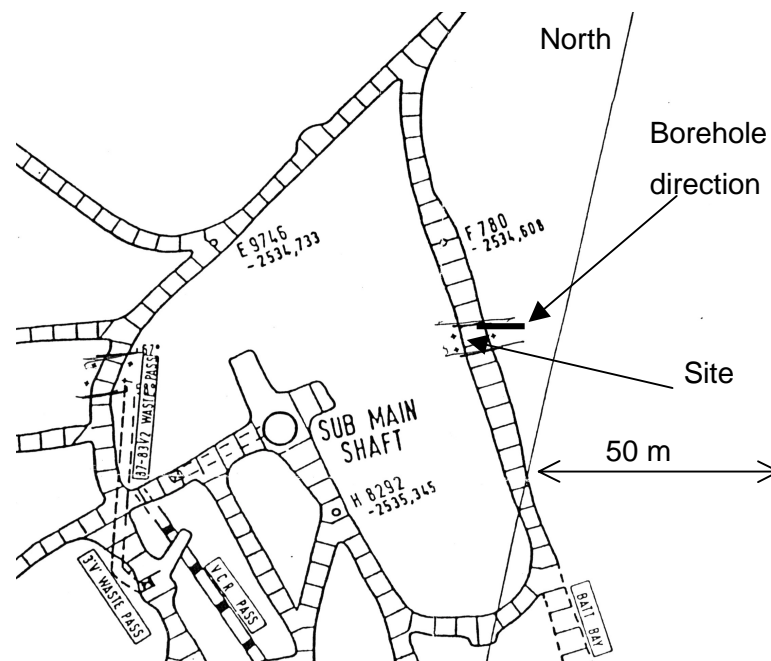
Plan of the site on 83 Level at Tau Tona
